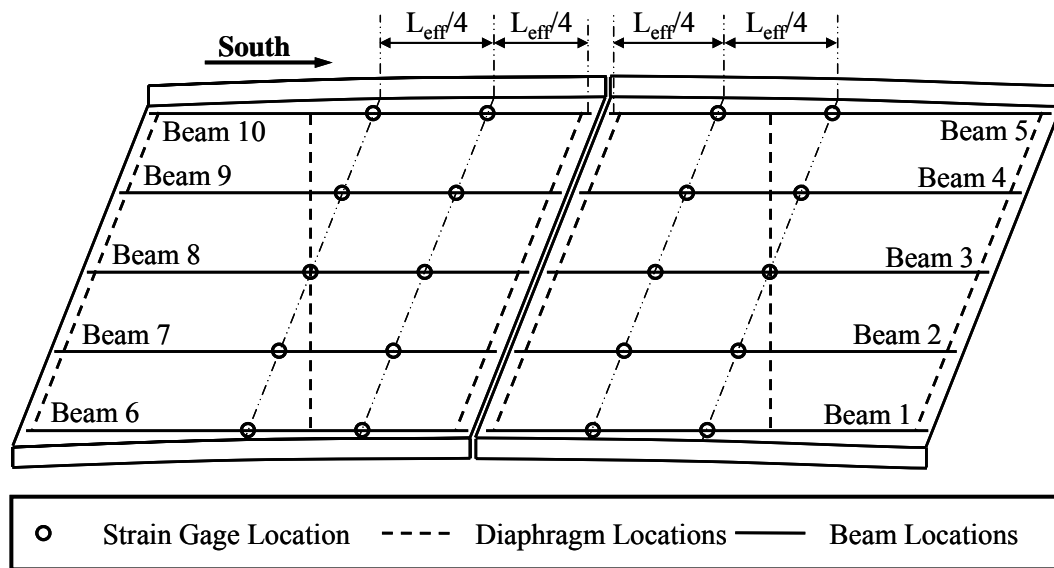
Instrumentation Plan for Wimberley Load Tests
